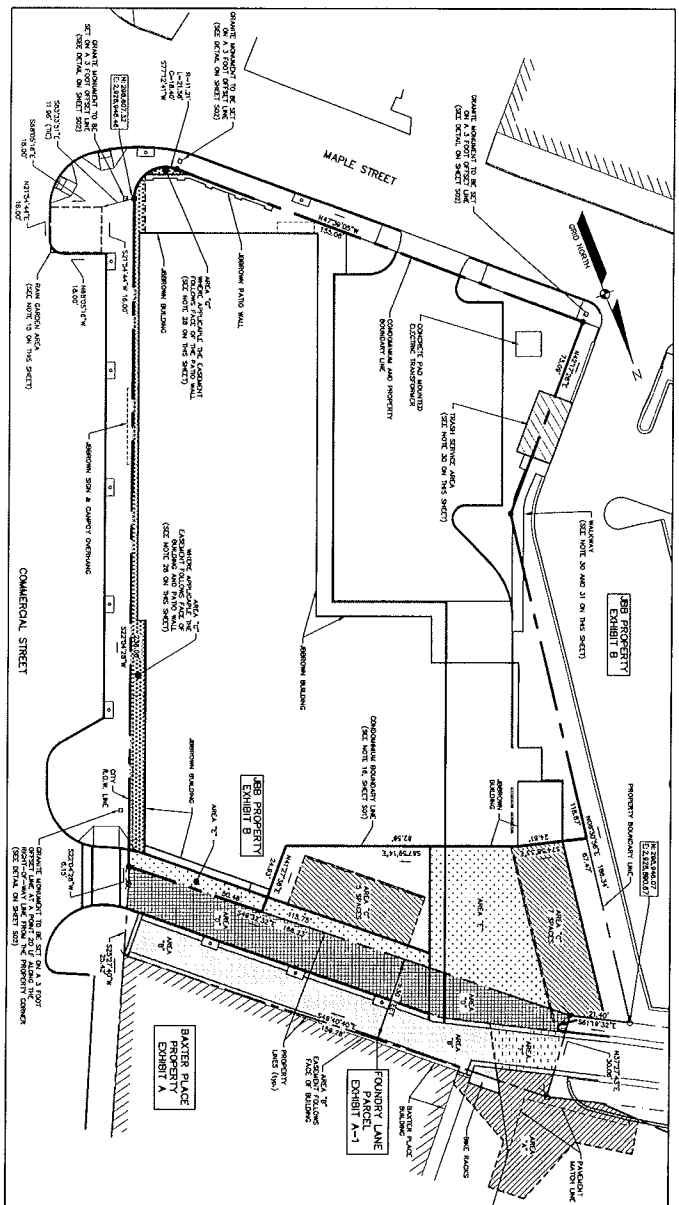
Exhibit C: Post-Construction Stormwater Management Plan dated May 16, 2014.
